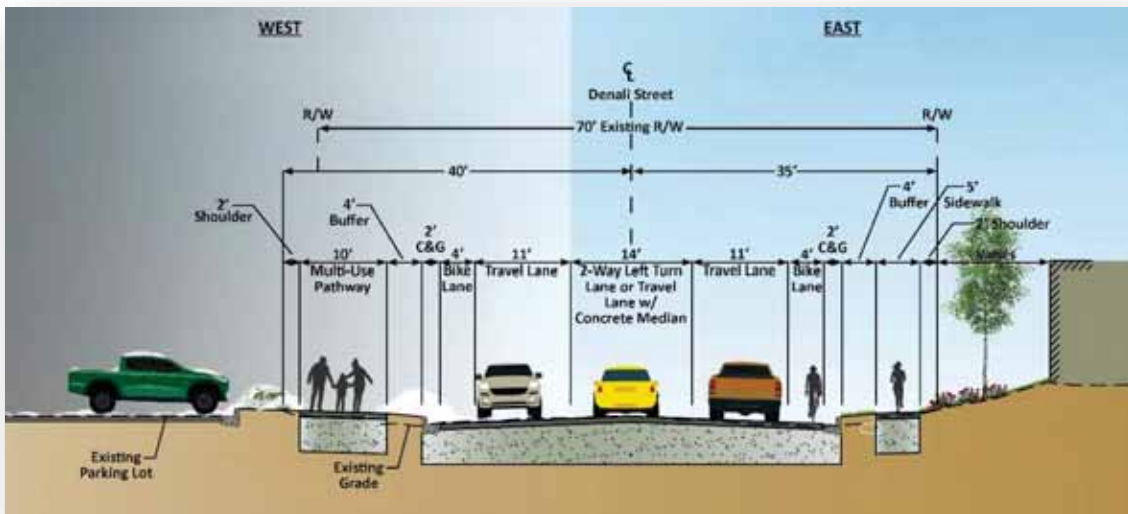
Denali Street (36th Avenue to Benson Boulevard) – Alternative 3
